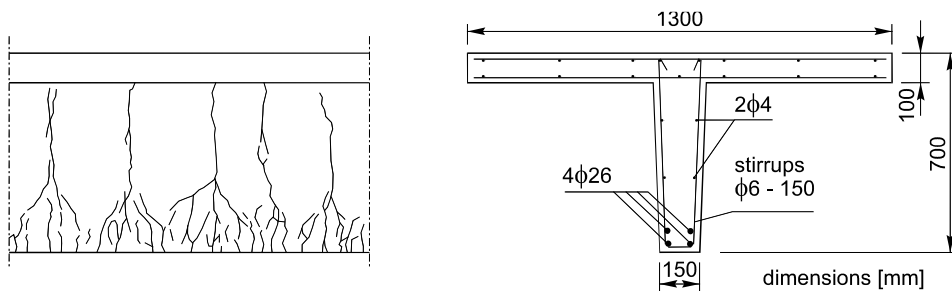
Crack pattern in deep beam with only reinforcement at the bottom and hardly any web reinforcement loaded in pure bending
